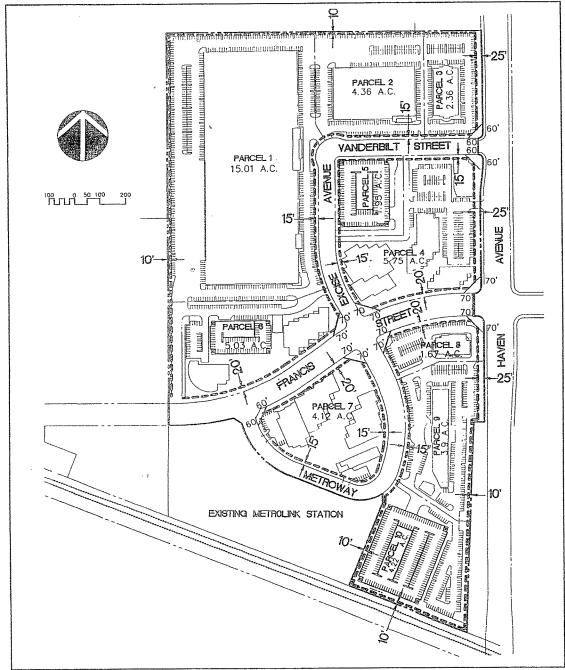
Minimum Setback Diagram (note changes to plan, Preface, page iii)
